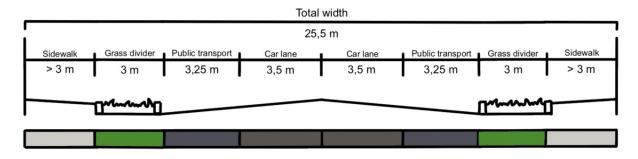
A Suggested cross-section for Elgeseter Street, with added grass dividers between the public transport lanes and sidewalks. (Made by: Susanna Hsu Hals)
